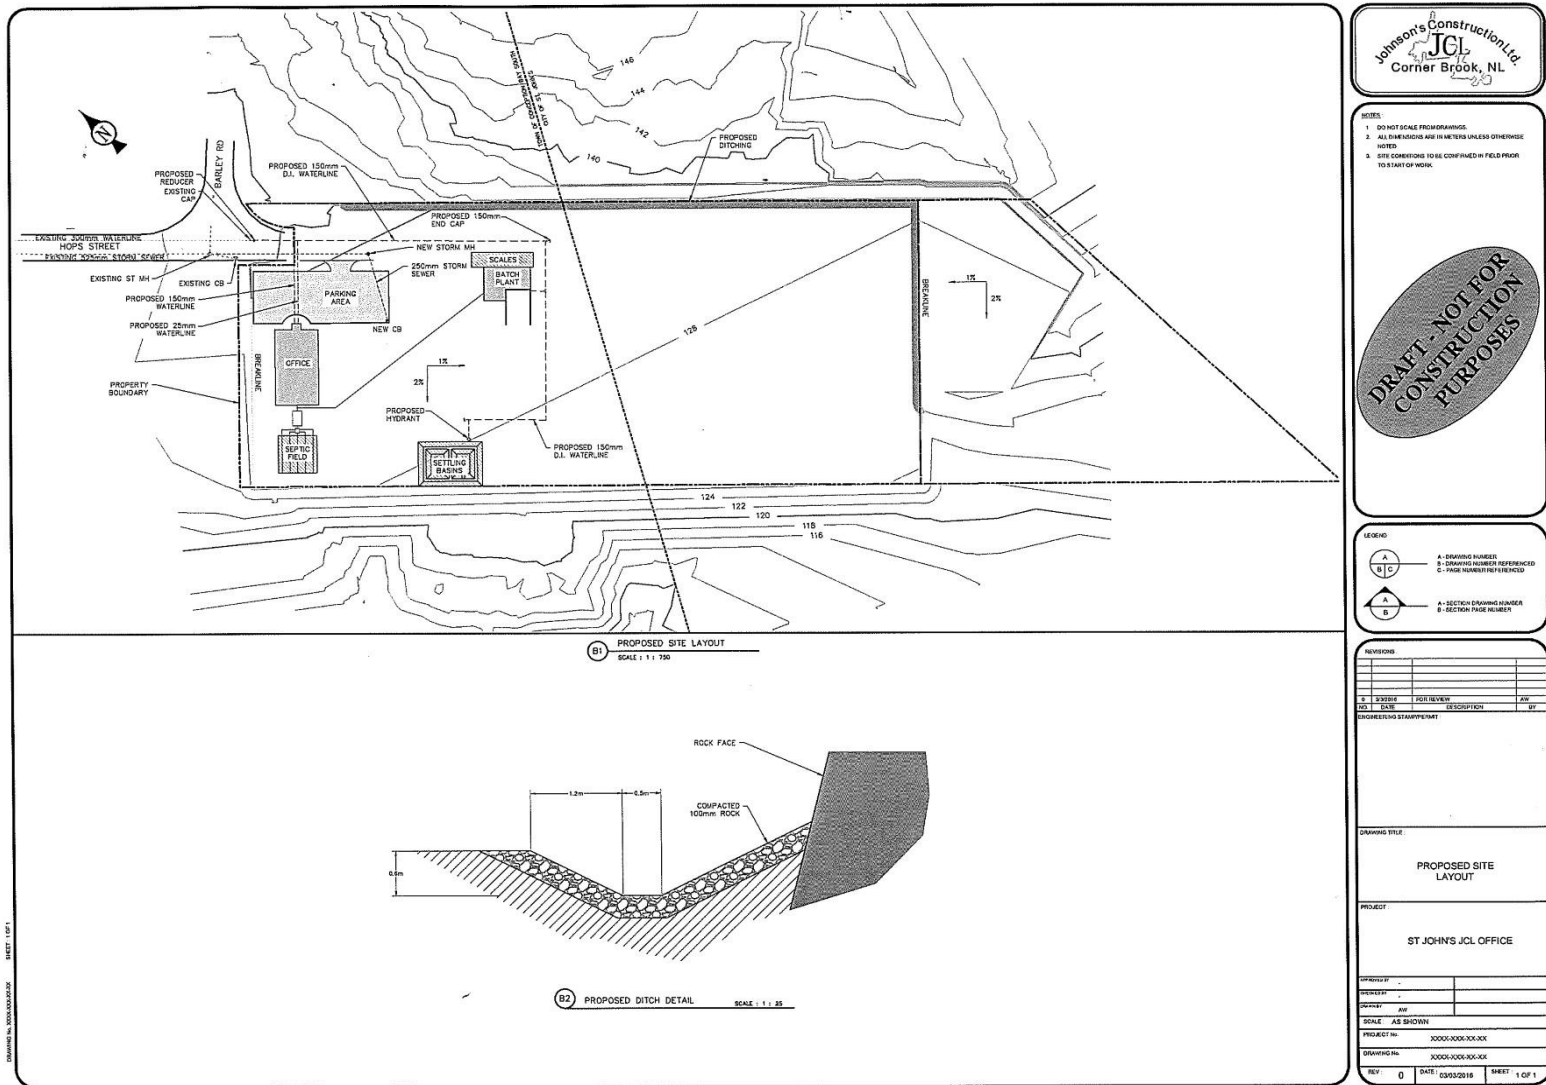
Detailed Site Drainage Plan of the Proposed Office Building and Concrete Operation
